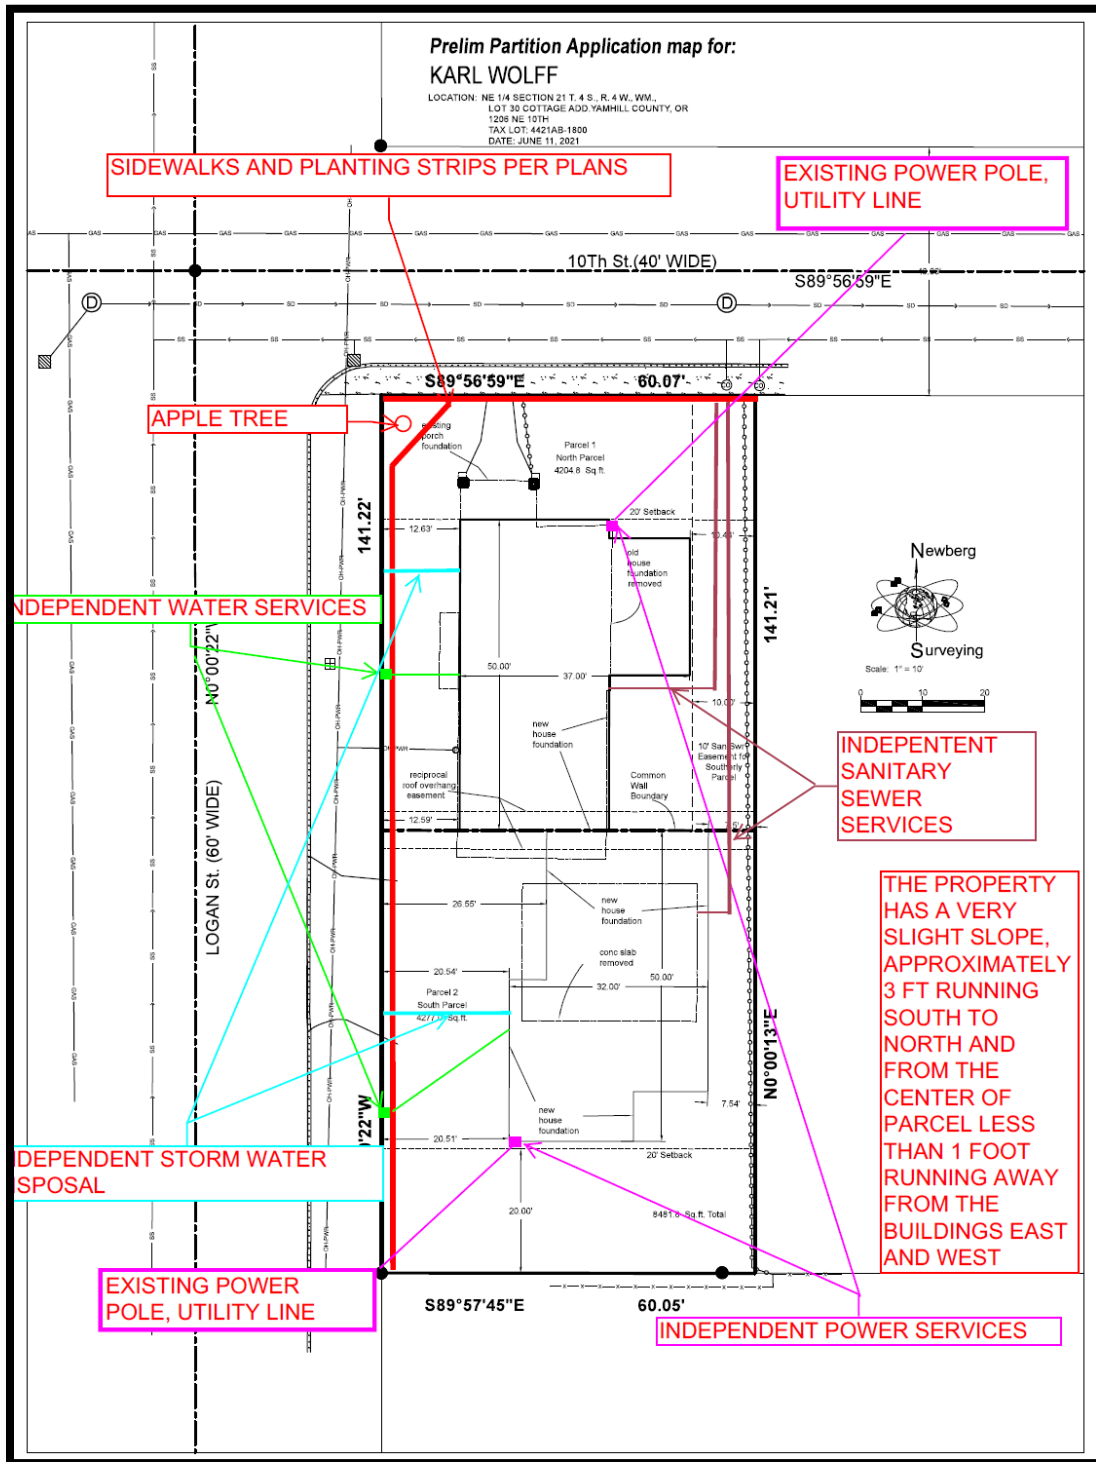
Applicant’s Proposed Partition Plan (Summary)
